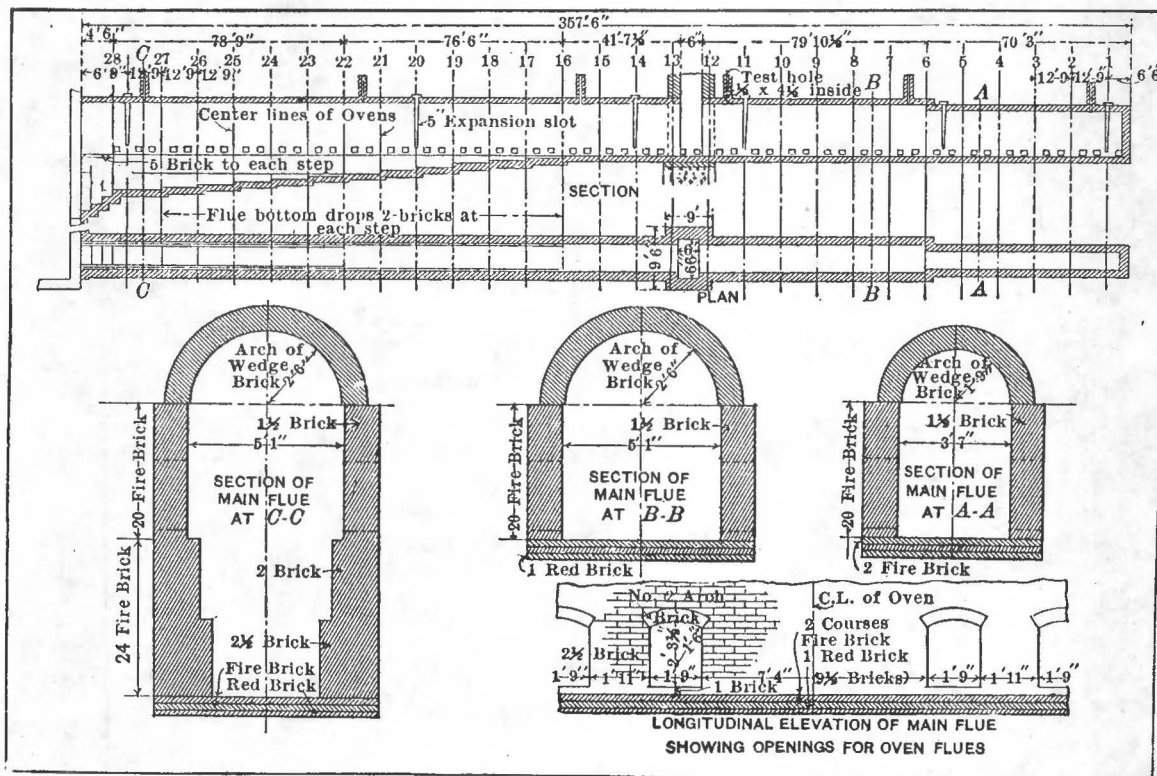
Elevation, Plan and Sections of Main Flue for Block of 56 Ovens.
